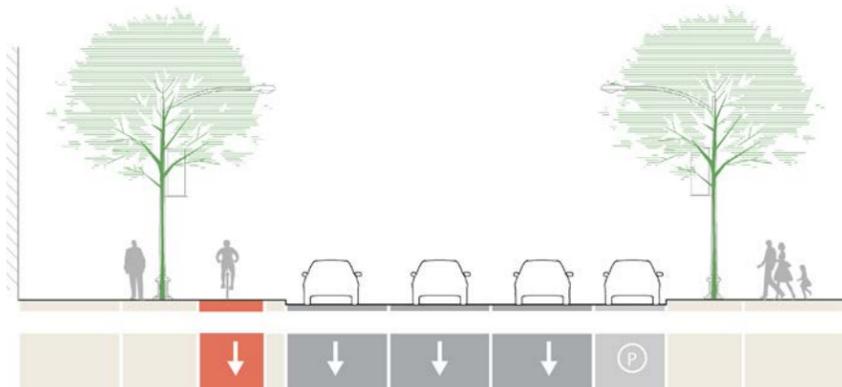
Fifth Street typical section Guadalupe Street to Brazos Street
